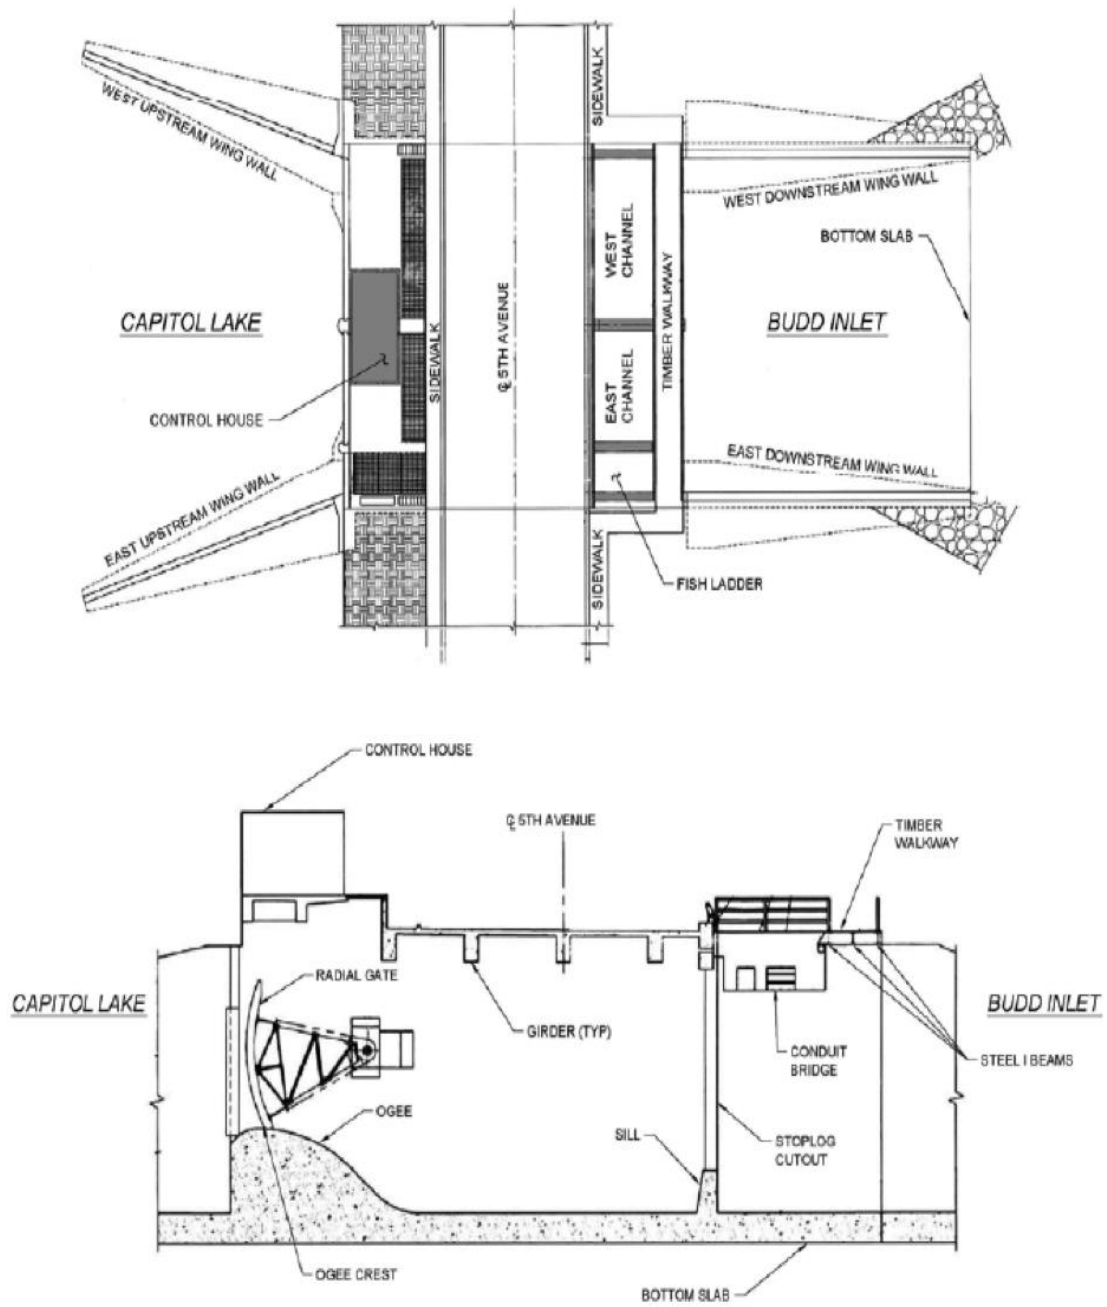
A detailed schematic design of the 5th Avenue Dam.
